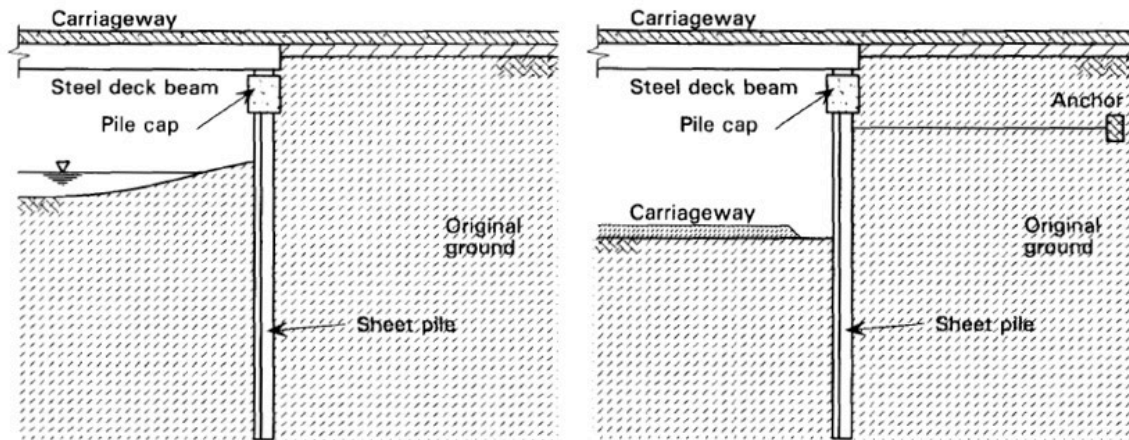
A design example of the sheet pile cantilever wall (left) and anchored retaining wall acting as a bridge abutment (right). Images are from Yandzio (1998).
